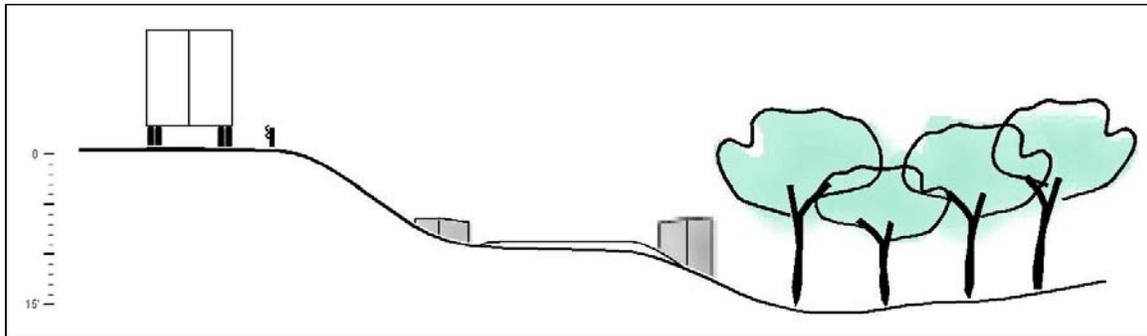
North-south cross-section of Fauquier and Alexandria Turnpike corridor approximately 45 feet west of the western stone abutment, showing relationship between stone bridge abutment (gray shading) and historic road bed, Route 29 (upper left) and natural drainage and vegetation (lower right).
